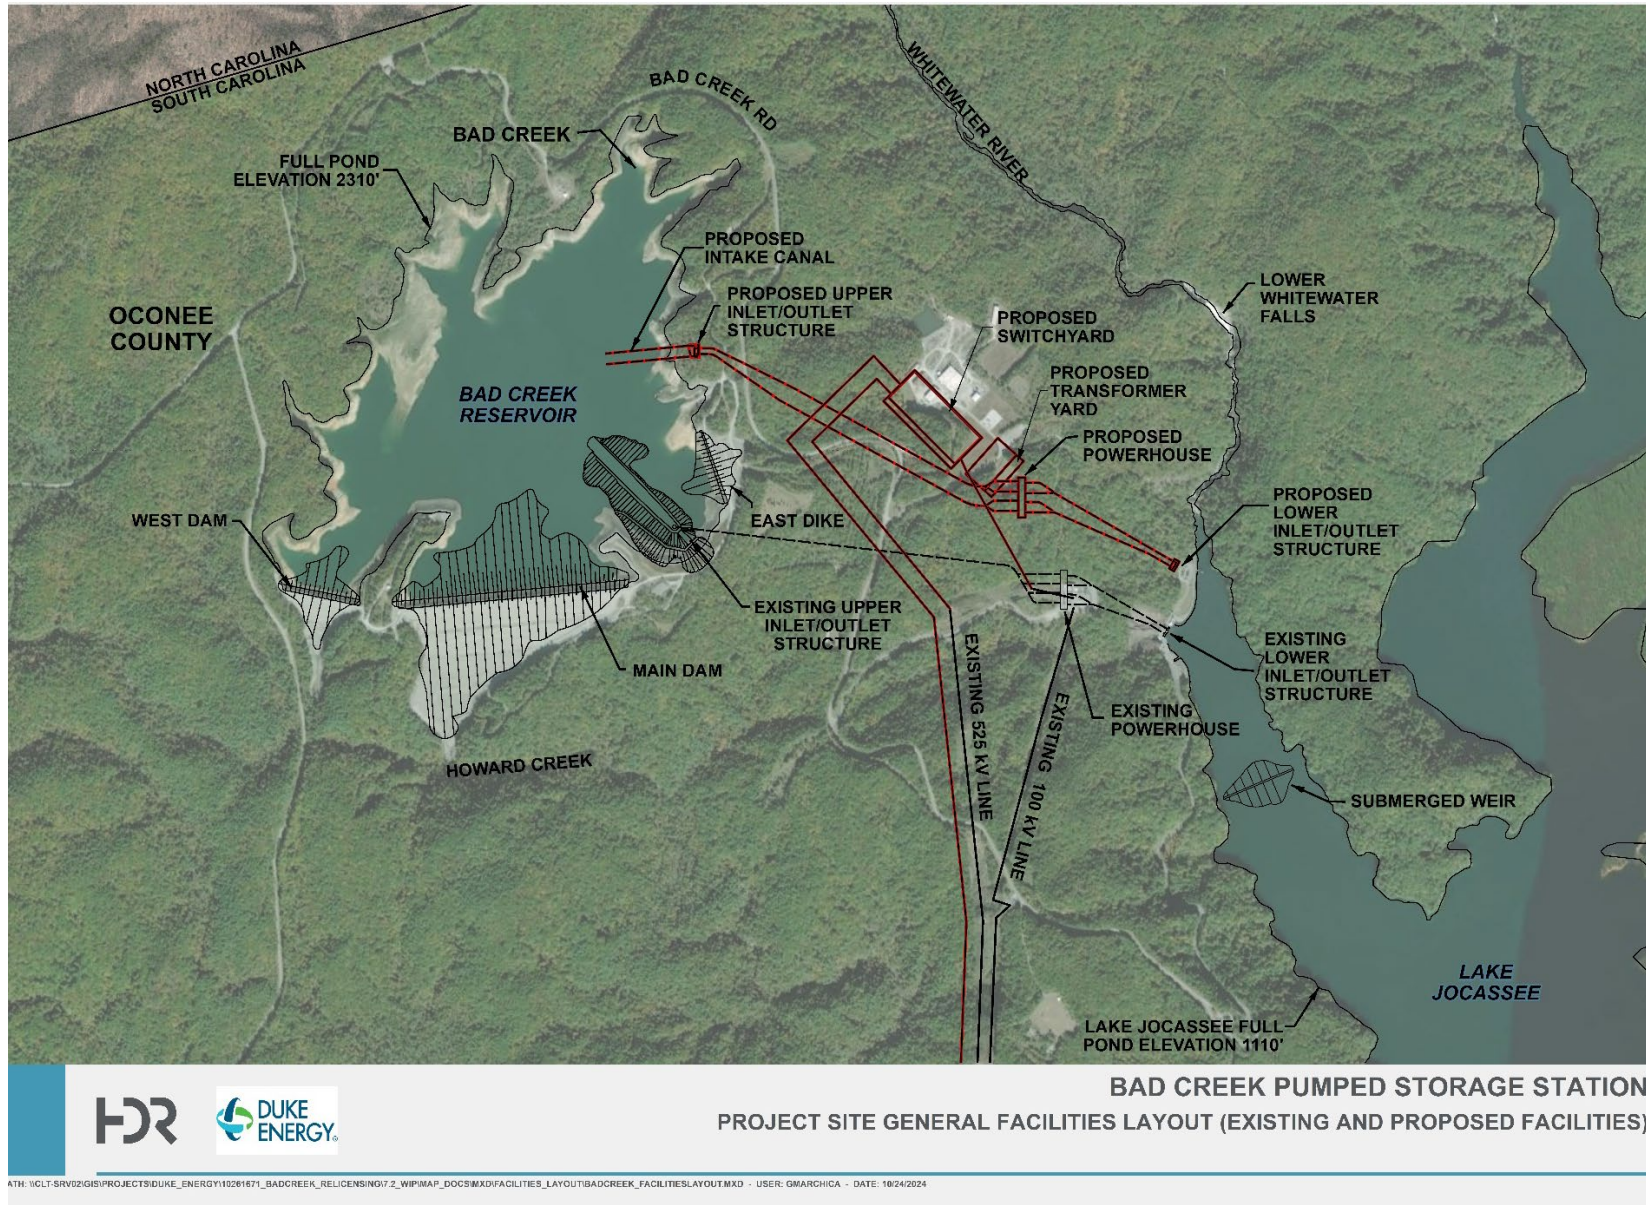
Proposed Bad Creek II Facilities Layout (Major Existing Bad Creek Project Facilities also Shown)
